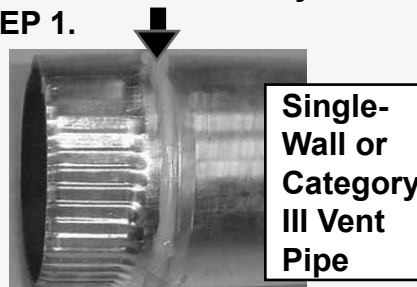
C. Attaching Double-Wall (Type B) Terminal Pipe to Single Wall or Category III Vent Pipe Run
